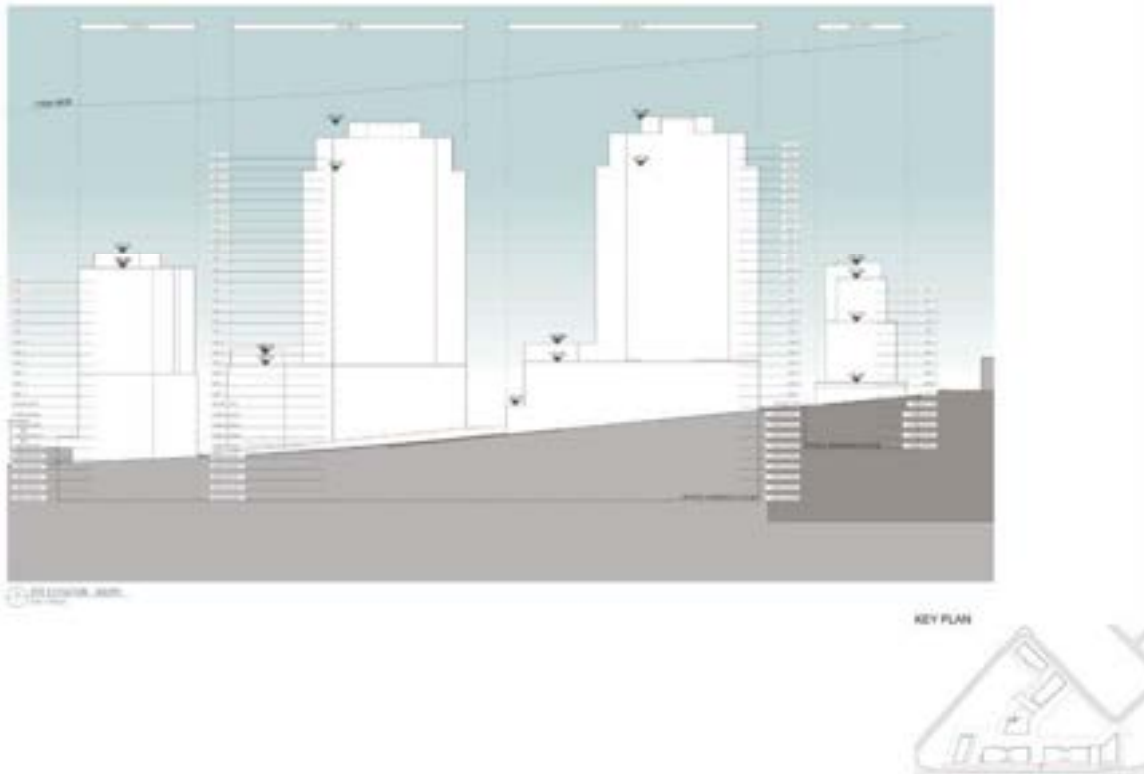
PP01.17 Site Envelope Elevations – South. *Source:* Fender Katsalidis 2023.
